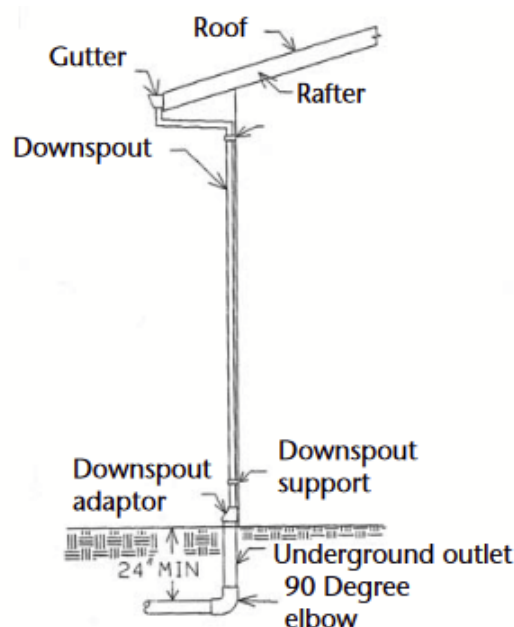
A typical downspout associated with an underground outlet (Stienbarger, 1996).
